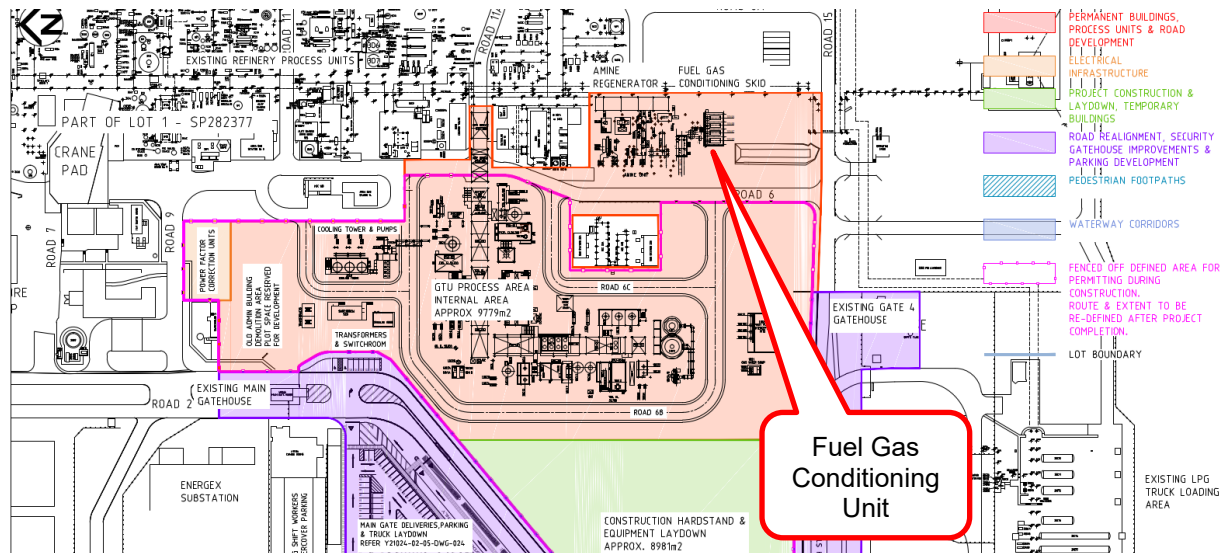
Proposed Modified Overall Site Plan Extract (Drawing Y21024-02-05-DWG-016, Appendix C)
